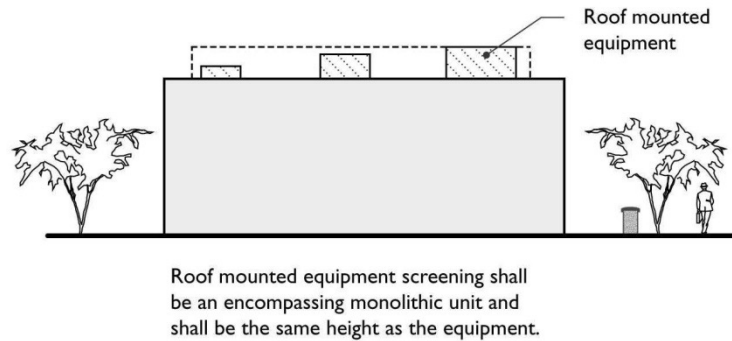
(h)(i) Screening of Roof Mounted Equipment
